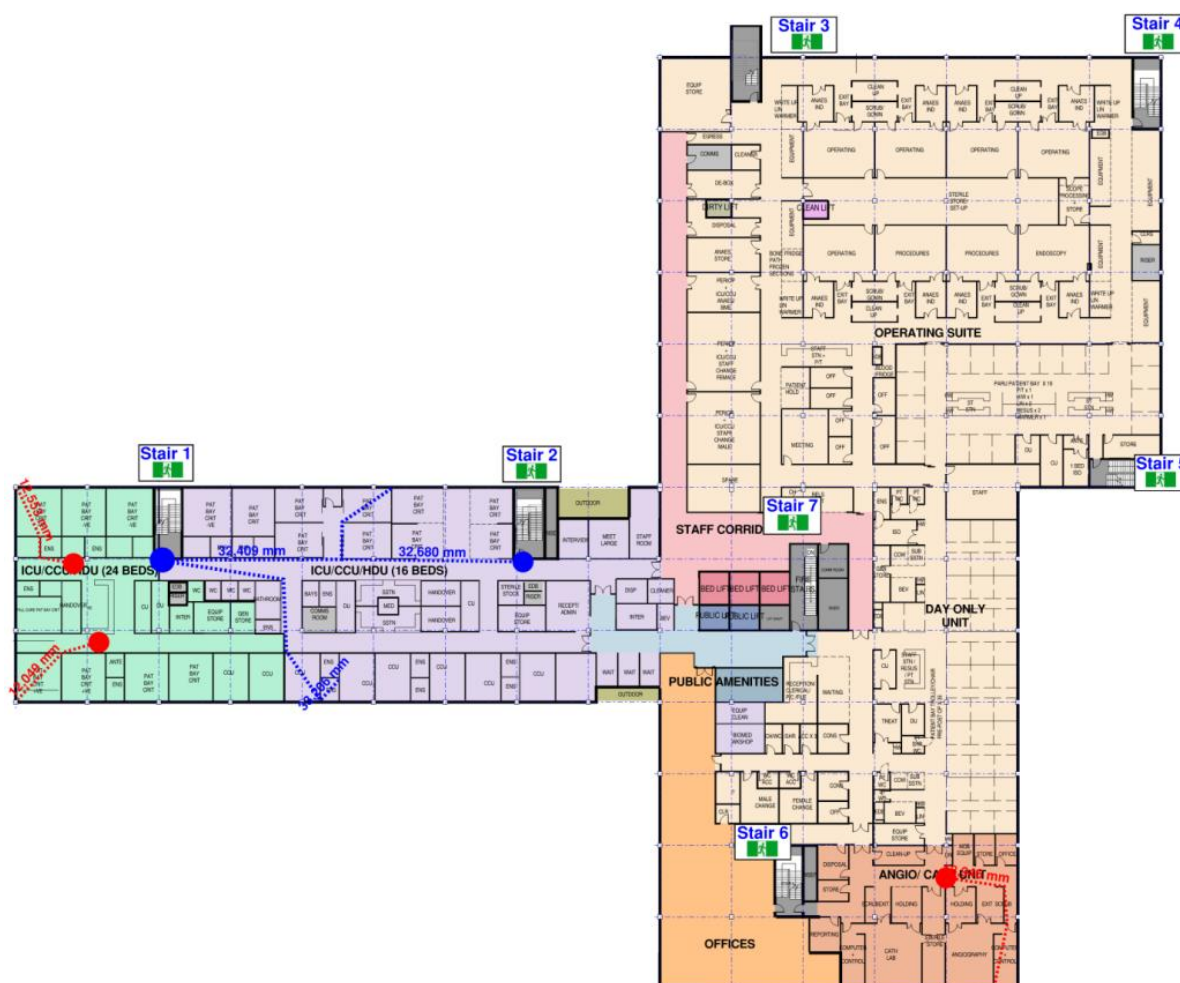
Indicative required exit (fire isolated stairs) for the Acute Services building (horizontal exits not shown)
